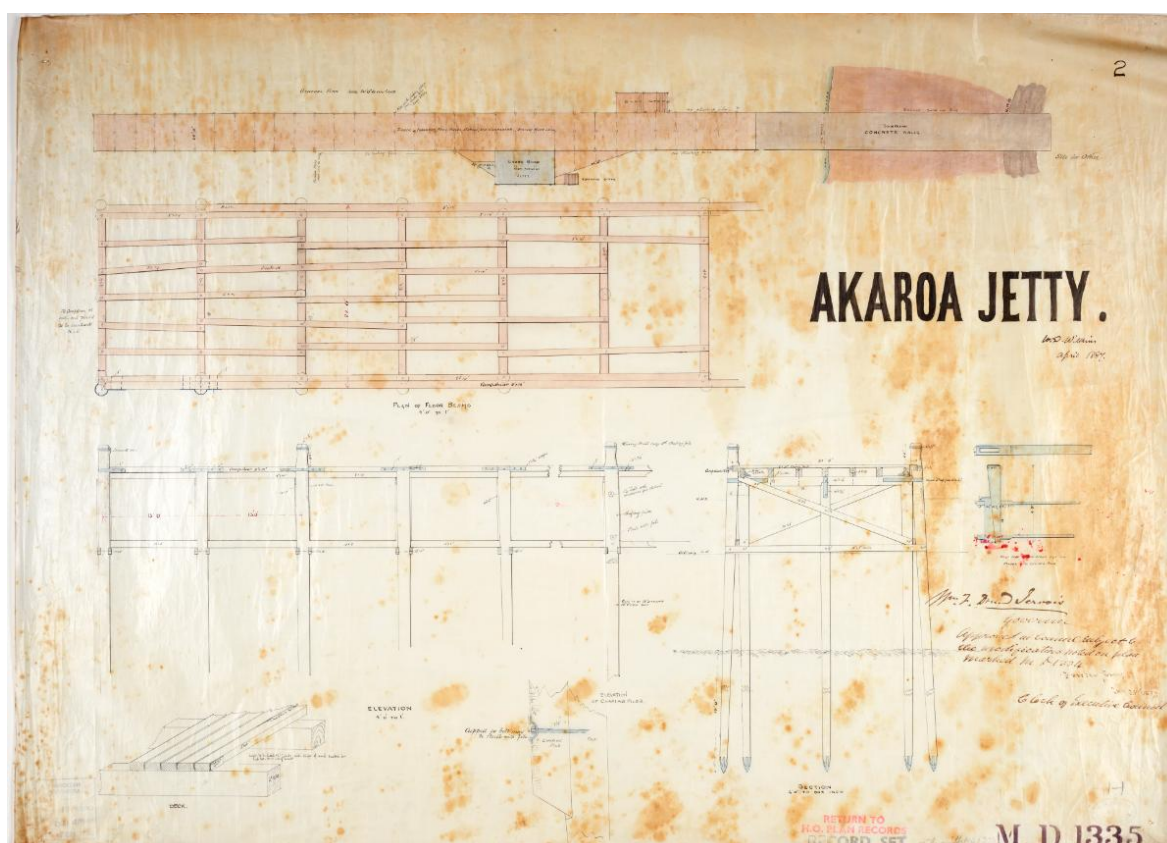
Plan, section, and elevation of timber portion of Akaroa Wharf. Source: Wellington Archives New Zealand.
